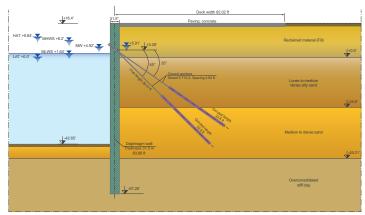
Cross section of the cruise ship terminal with steel sheet piles and with a diaphragm wall (design by *Tractebel Engineering*).
